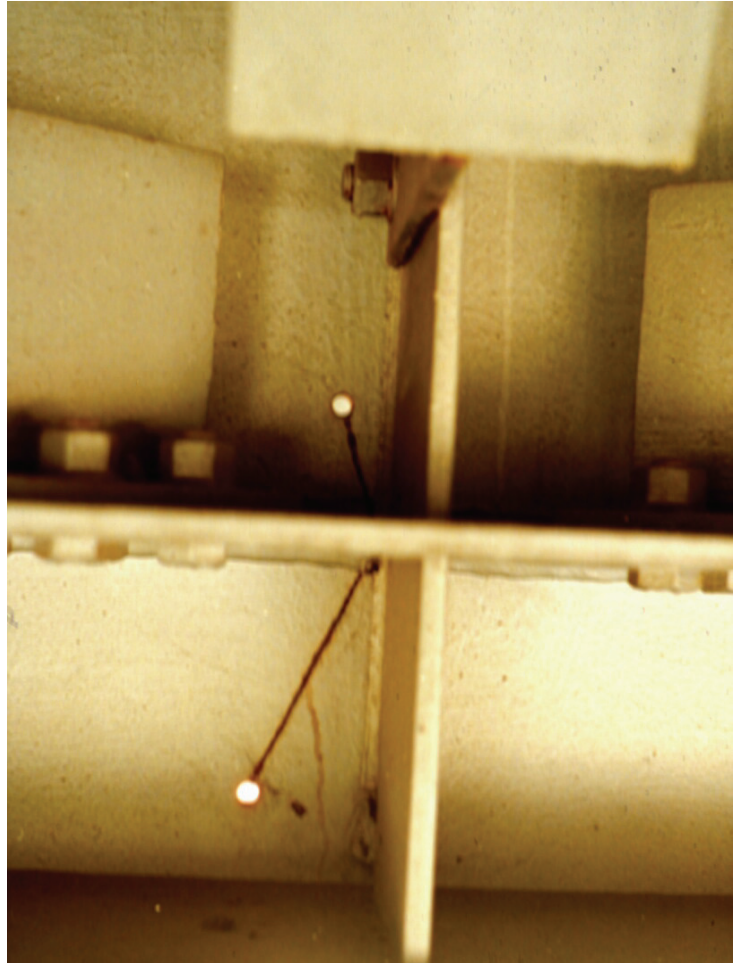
Cracking in Girder Web at the Intersection of Horizontal Gusset Plate for Lateral Bracing and Transverse Stiffener
